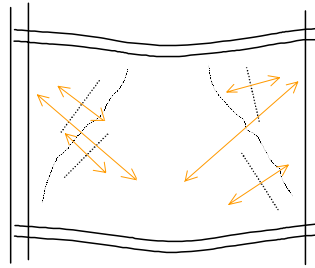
Development of Cracks in a Wall due to Slab Deflection
